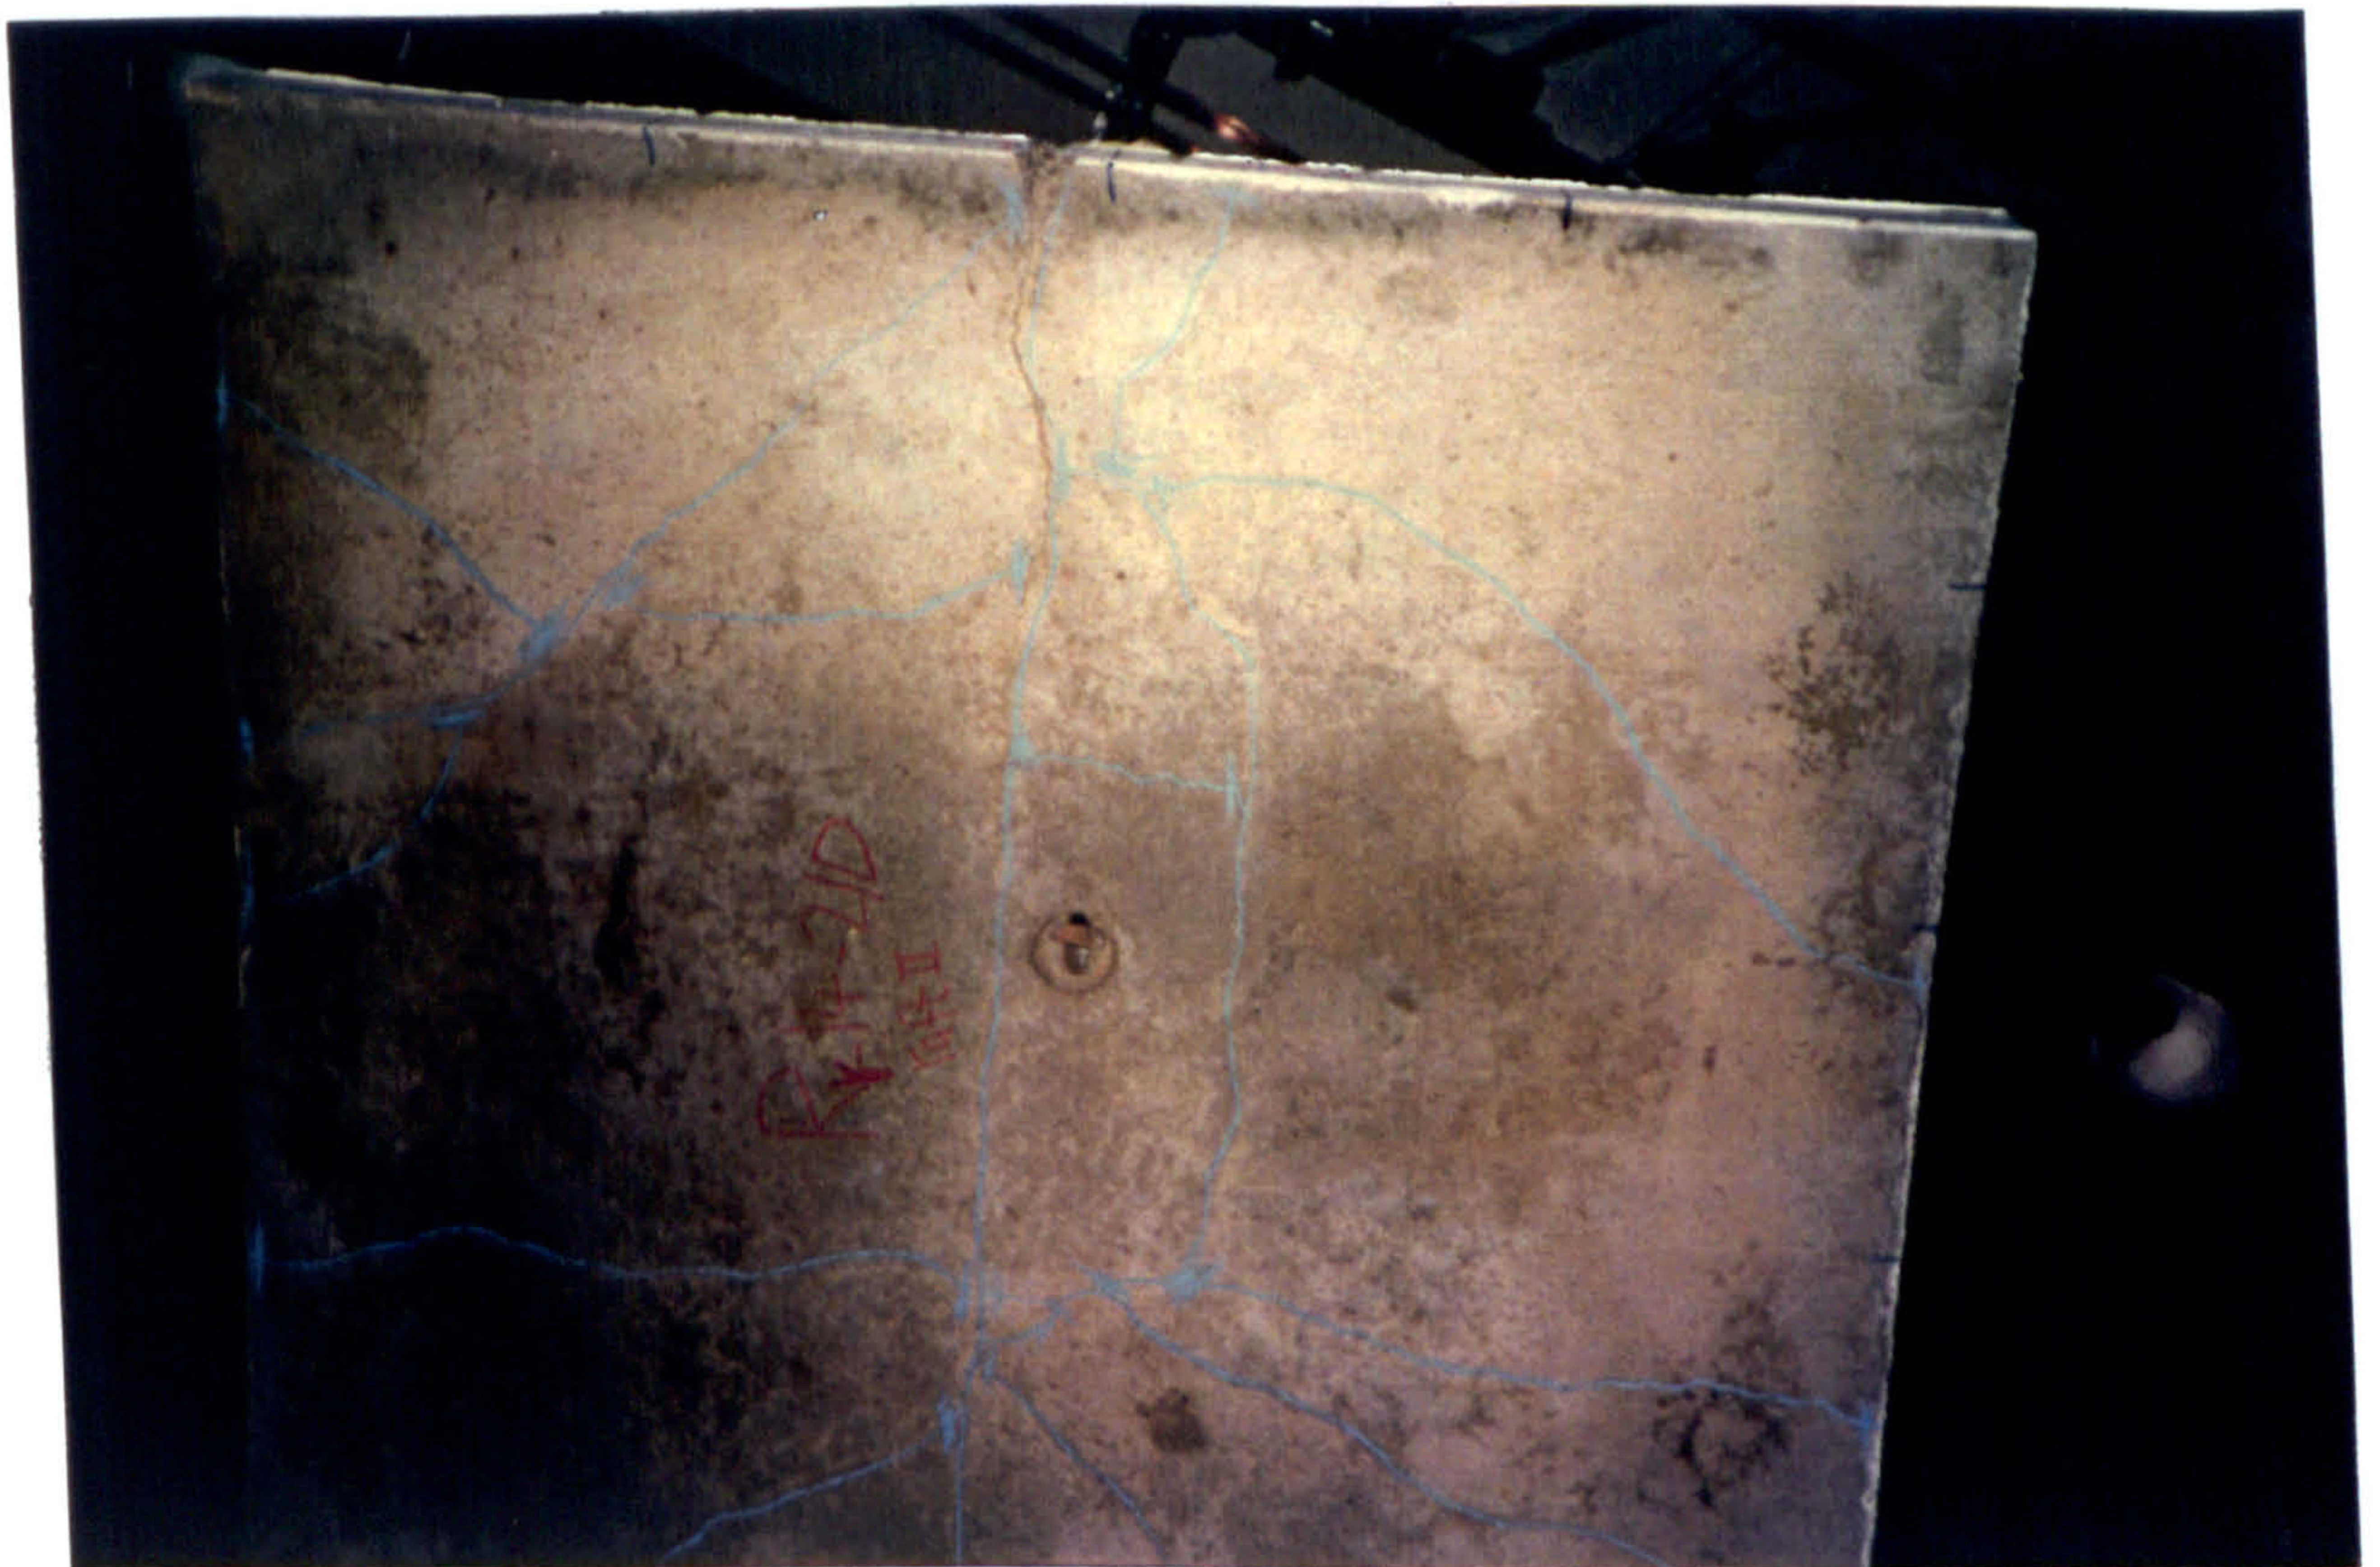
Full Penetration of the Main Transverse Crack at Failure
